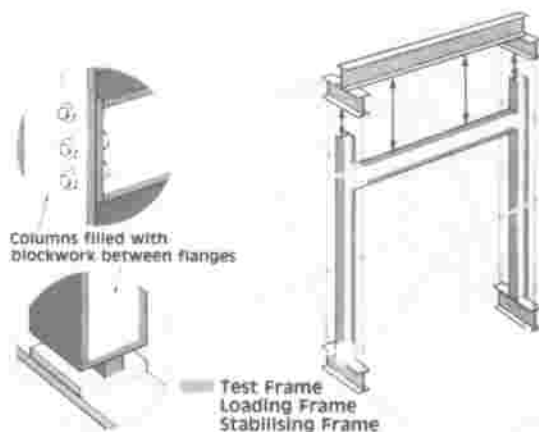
Schematic layout of the loaded frame used in the Cardington test.
